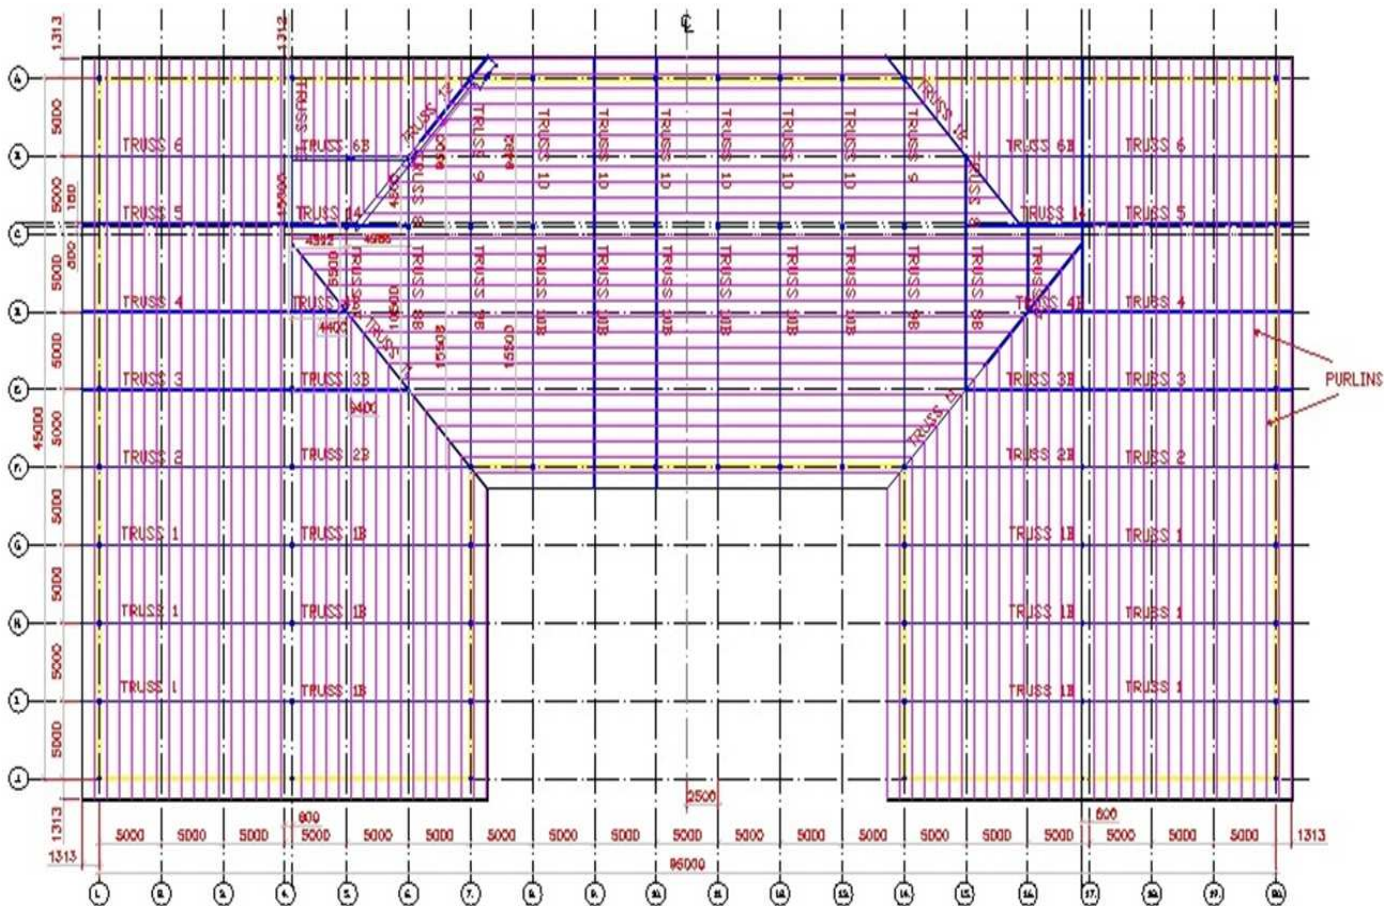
Steel Roof Truss Layout (All dimensions in mm).
